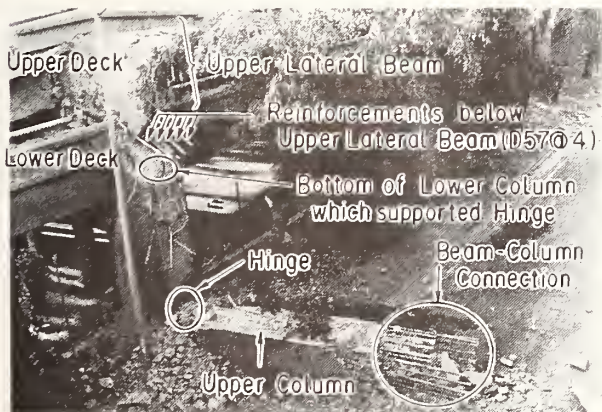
Collapse of Type 1 pier of Cypress Viaduct. Upper Deck completely fell down onto lower deck due to failures at hinge at the bottom of the upper column and at beam-column connection (from CALTRANS).
